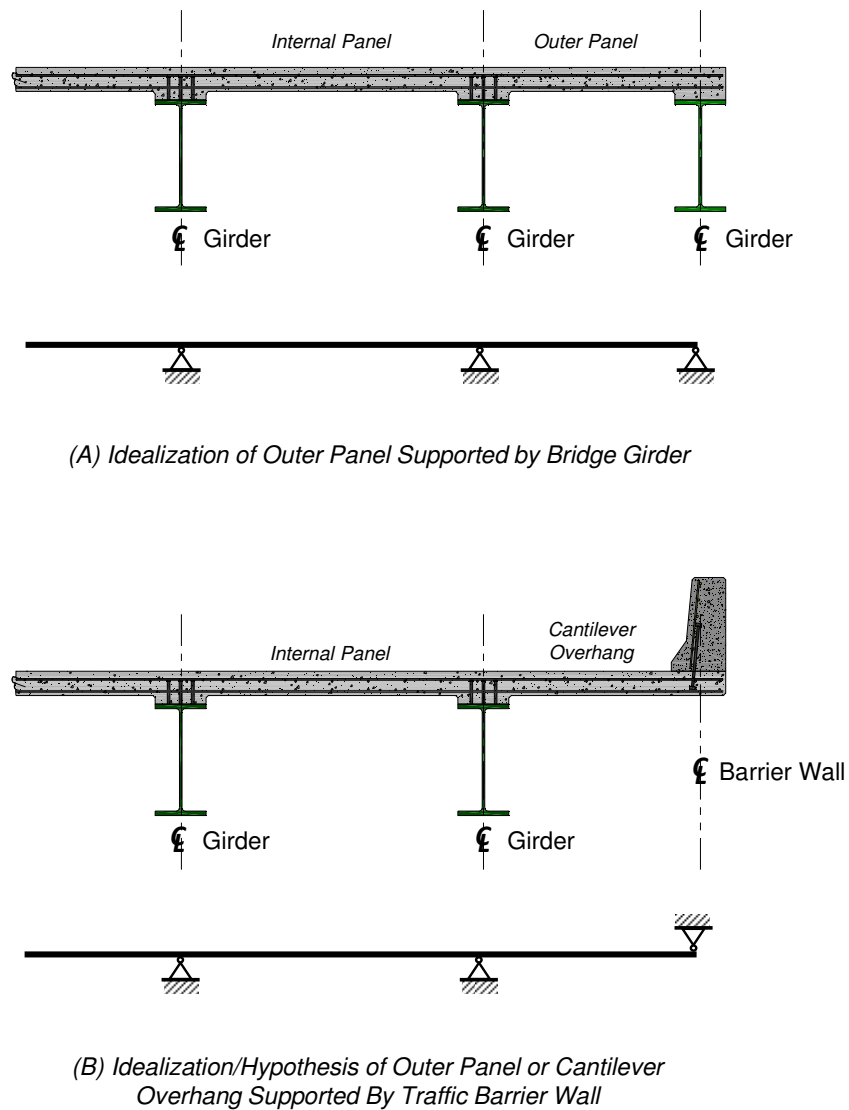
Idealization and hypothesis of a bridge deck cantilever slab overhang slab supported by traffic barrier wall
